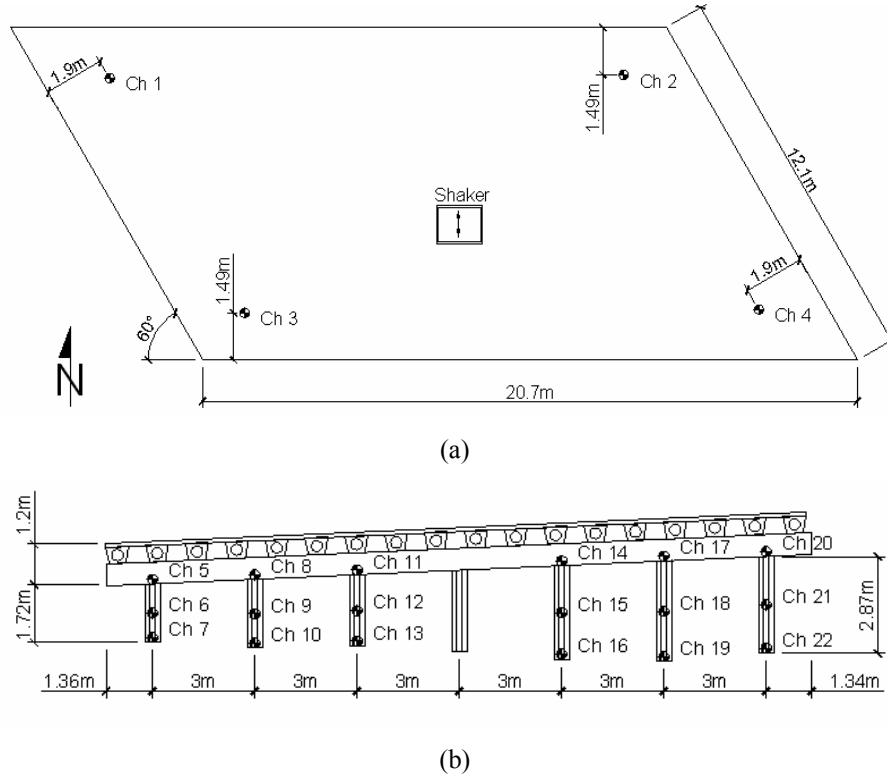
Bridge span dimensions and sensor locations on (a) deck and (b) southern pier.
